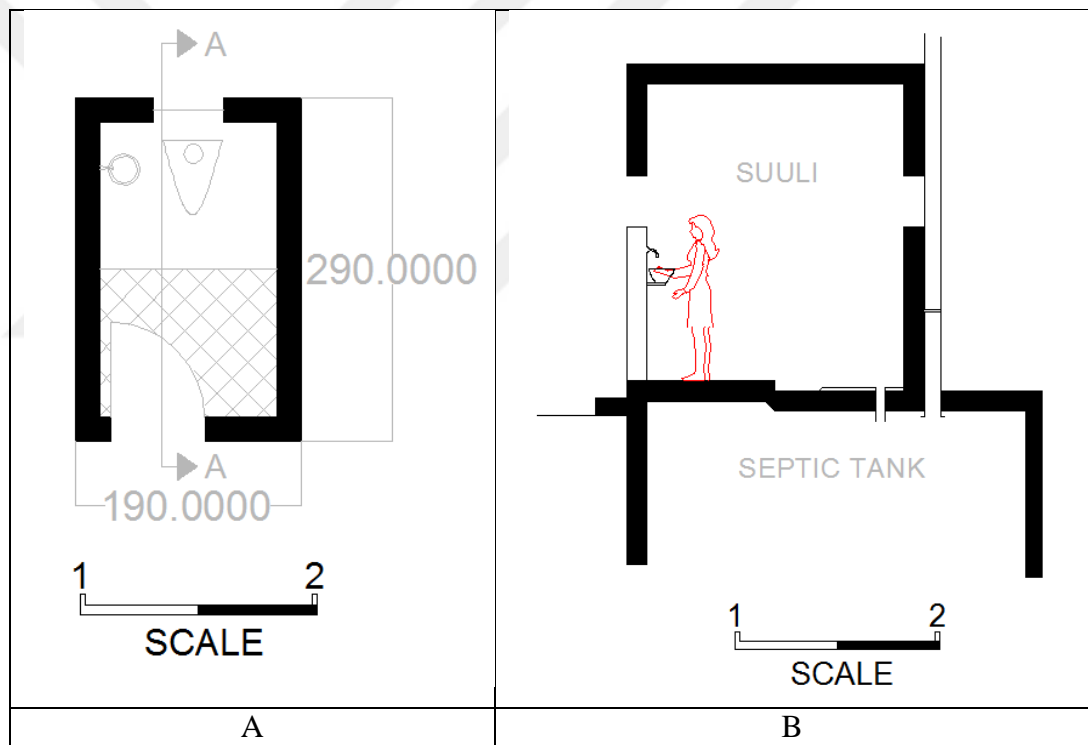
Shows: The Floor Plan of Suuli (A) And It's Elevation (B).
